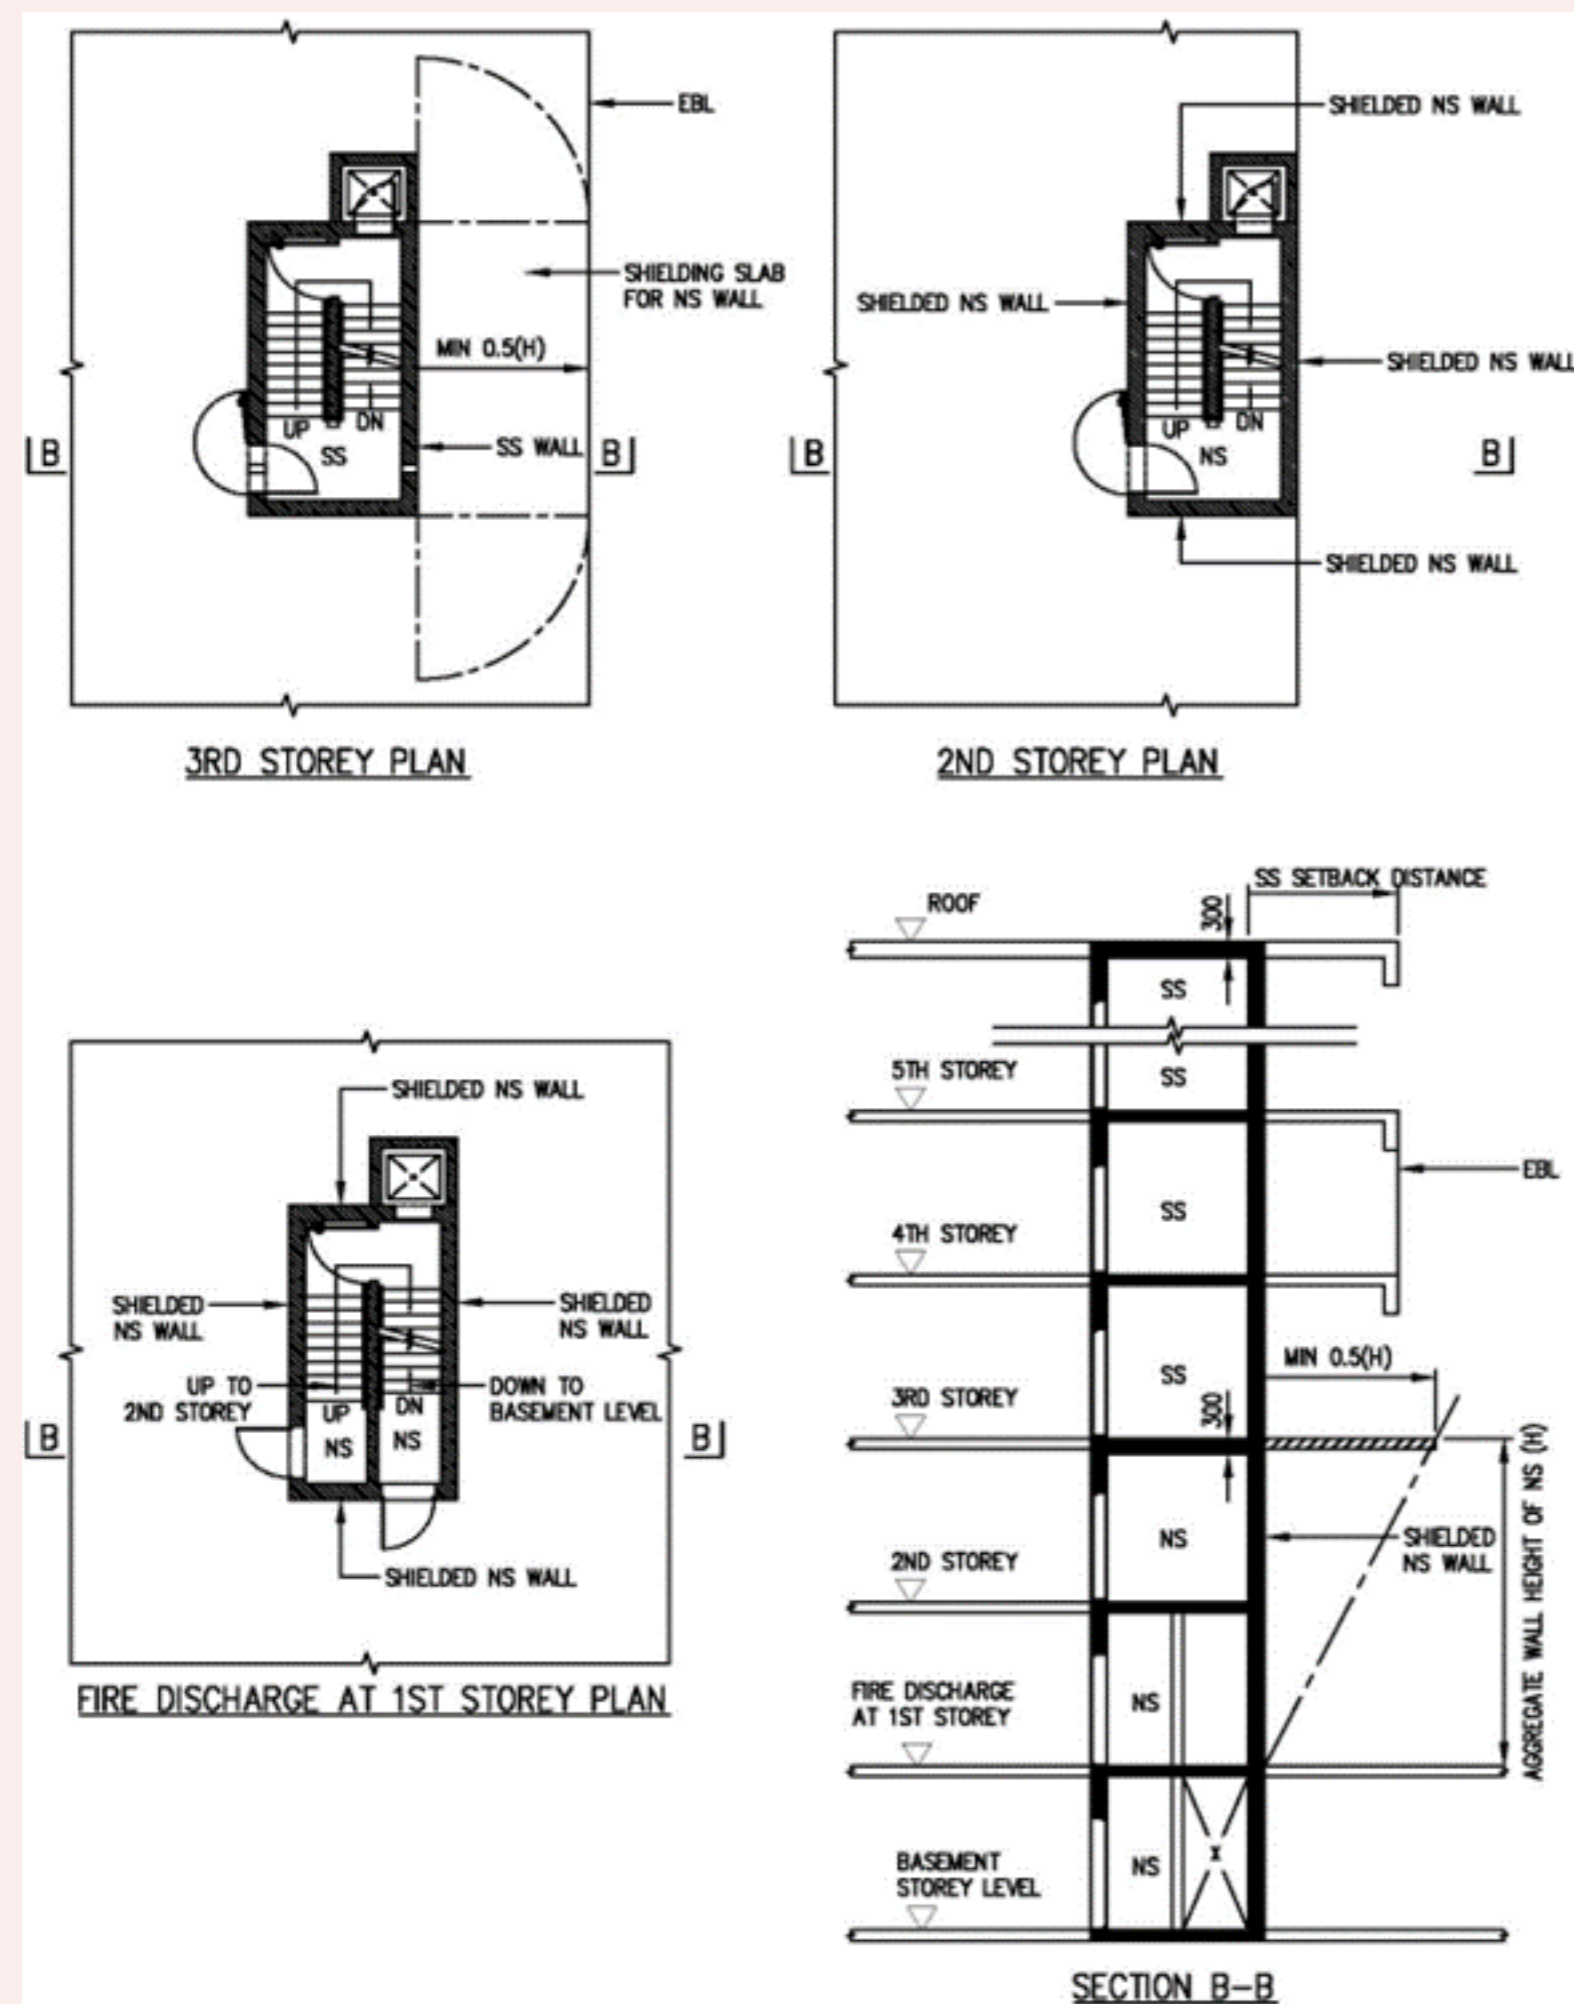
(c): SHIELDED NS WALL(S) OF S/C SS TOWER
